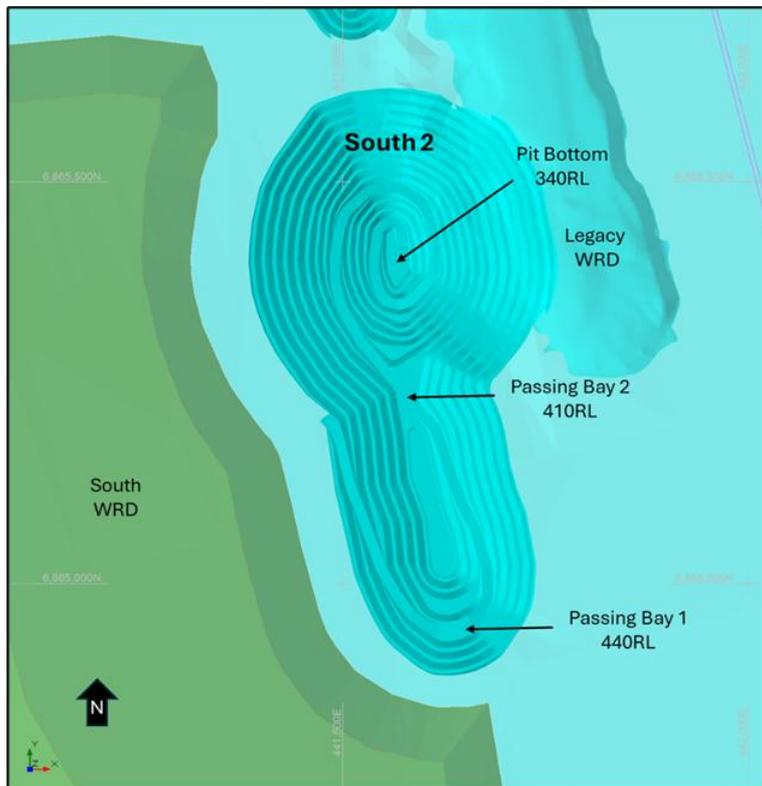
Plan view – Cork Tree Well – (South 2) pit design
